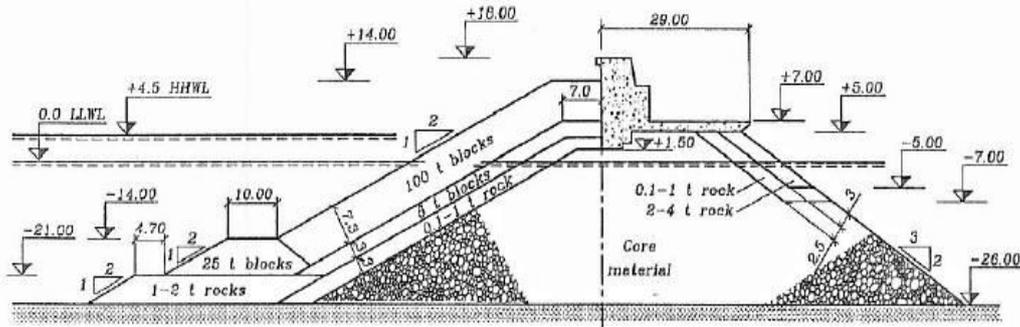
Typical cross section, rubble-mound breakwater with concrete parapet wall.
